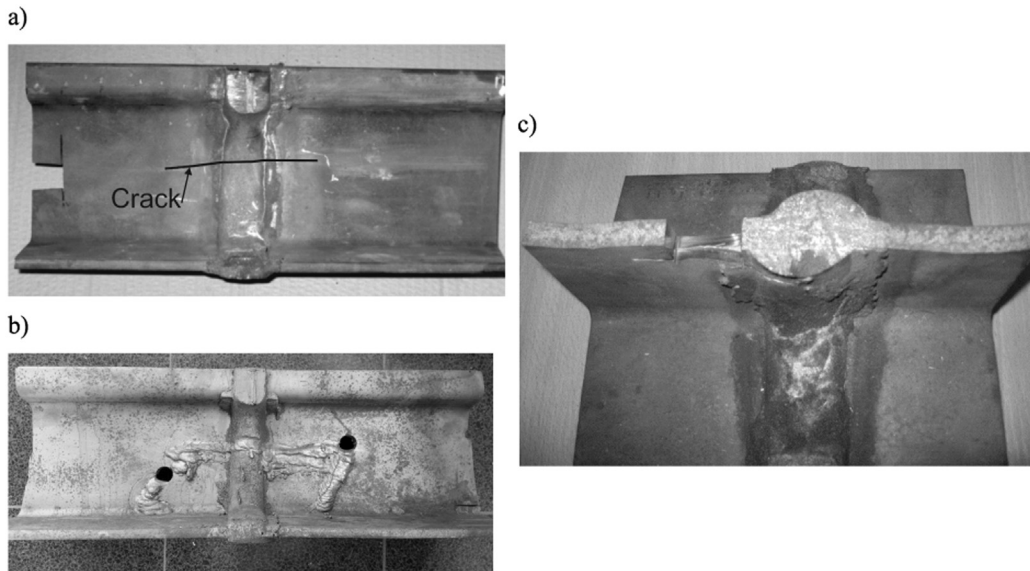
Sections of grooved tram rails: a) cracked right after thermite welding, b) cracked in the course of operation, c) bottom surface of the rail crack (Fig. 1a).
